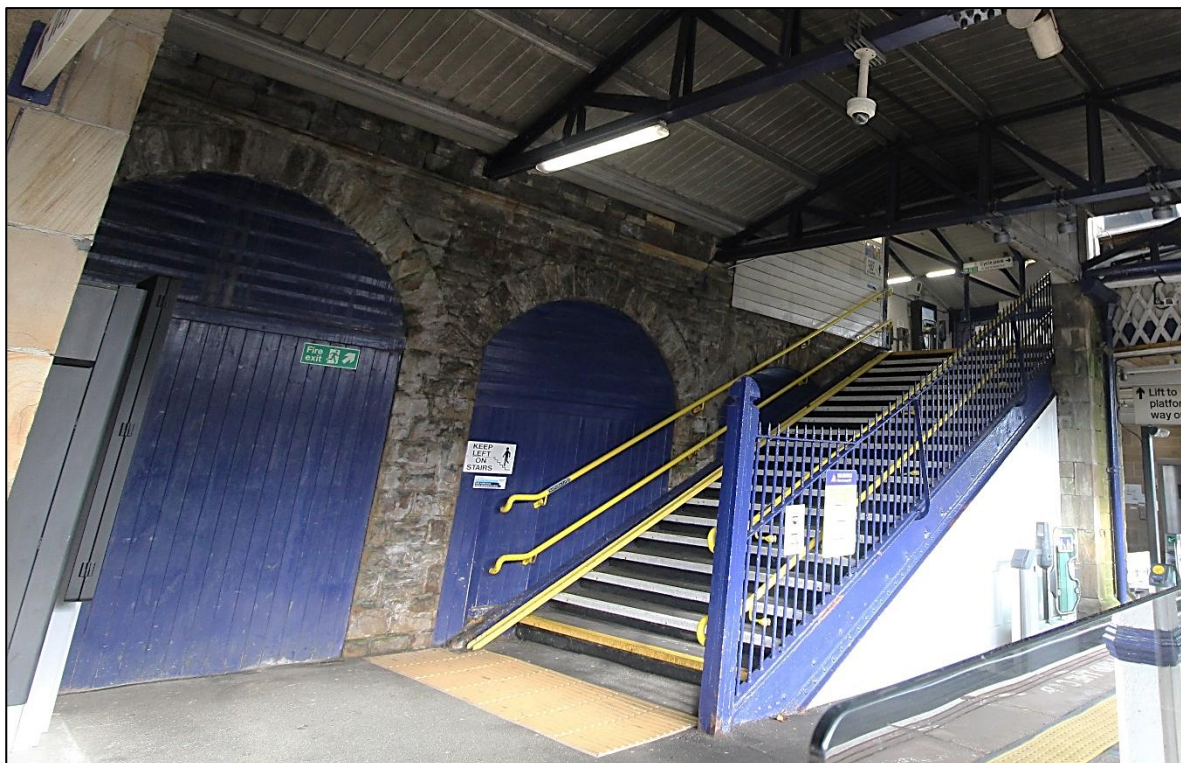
Platform 1, blocked archways and cast-iron railings, (IMG_2214)
